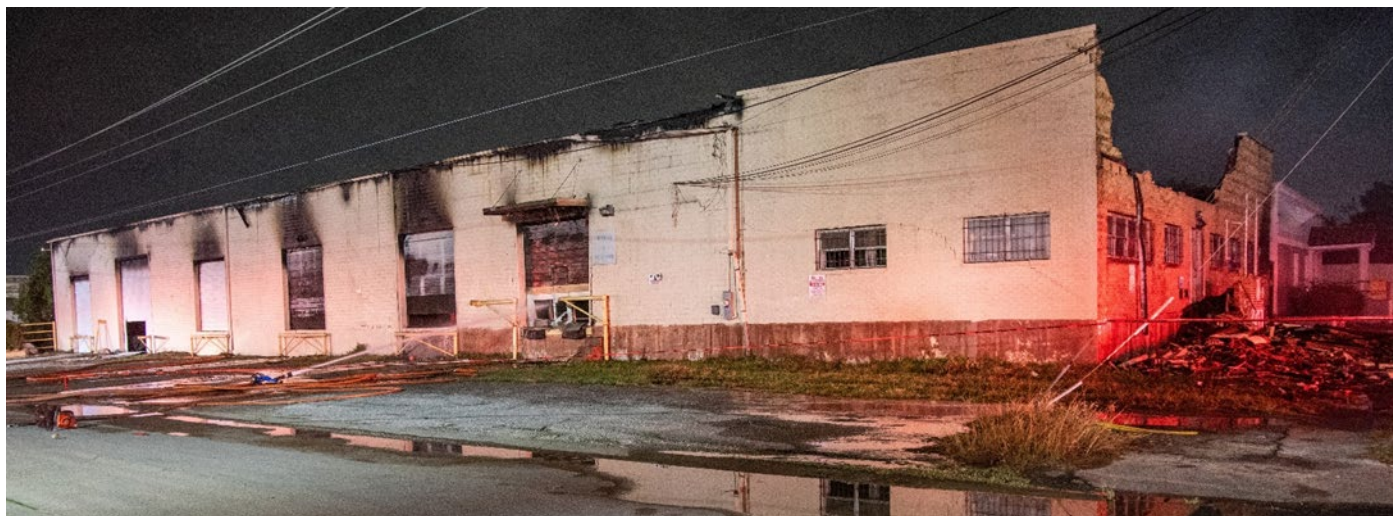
Detail of Delta side wall showing the brick veneer over block wall, slots for previous canopy roof tie ins, roof surface covering. (Courtesy of the fire department)
